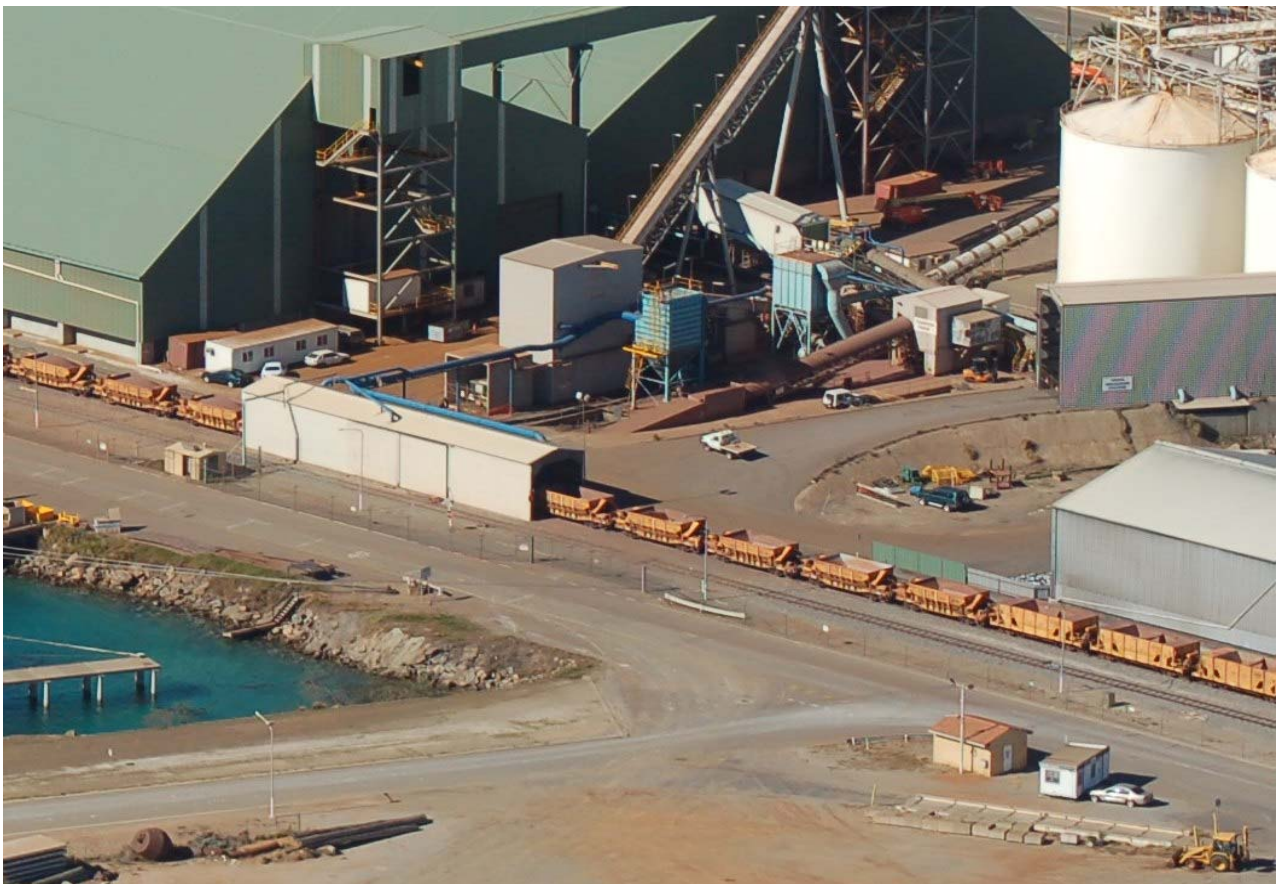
Existing Rail unloading facilities with materials handling system in background
